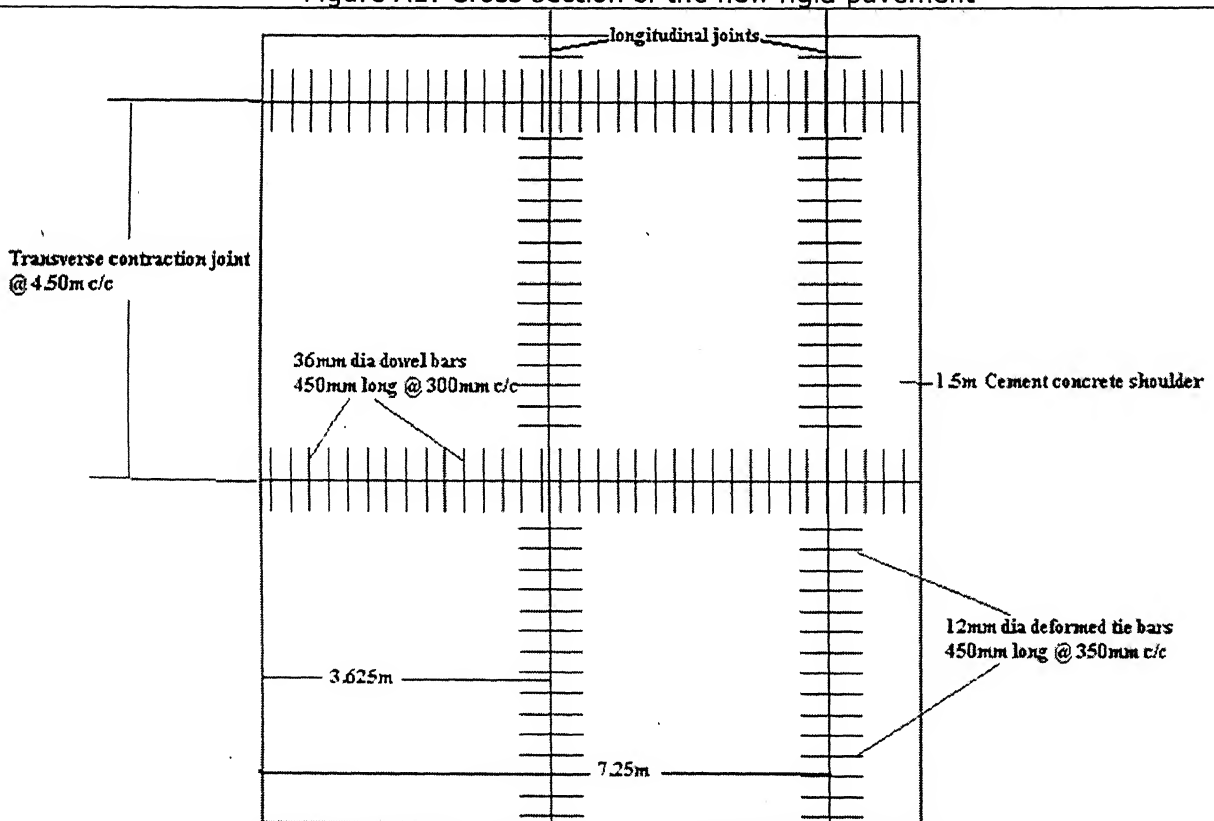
Plan of rigid pavement with transverse and longitudinal joints
